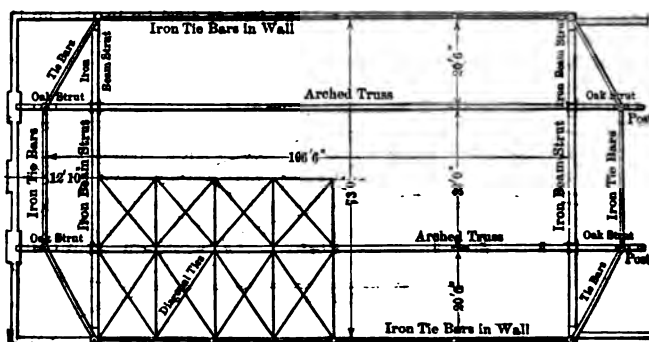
Plan of Truss-framing of Fifth Avenue Riding-school, New York City.
